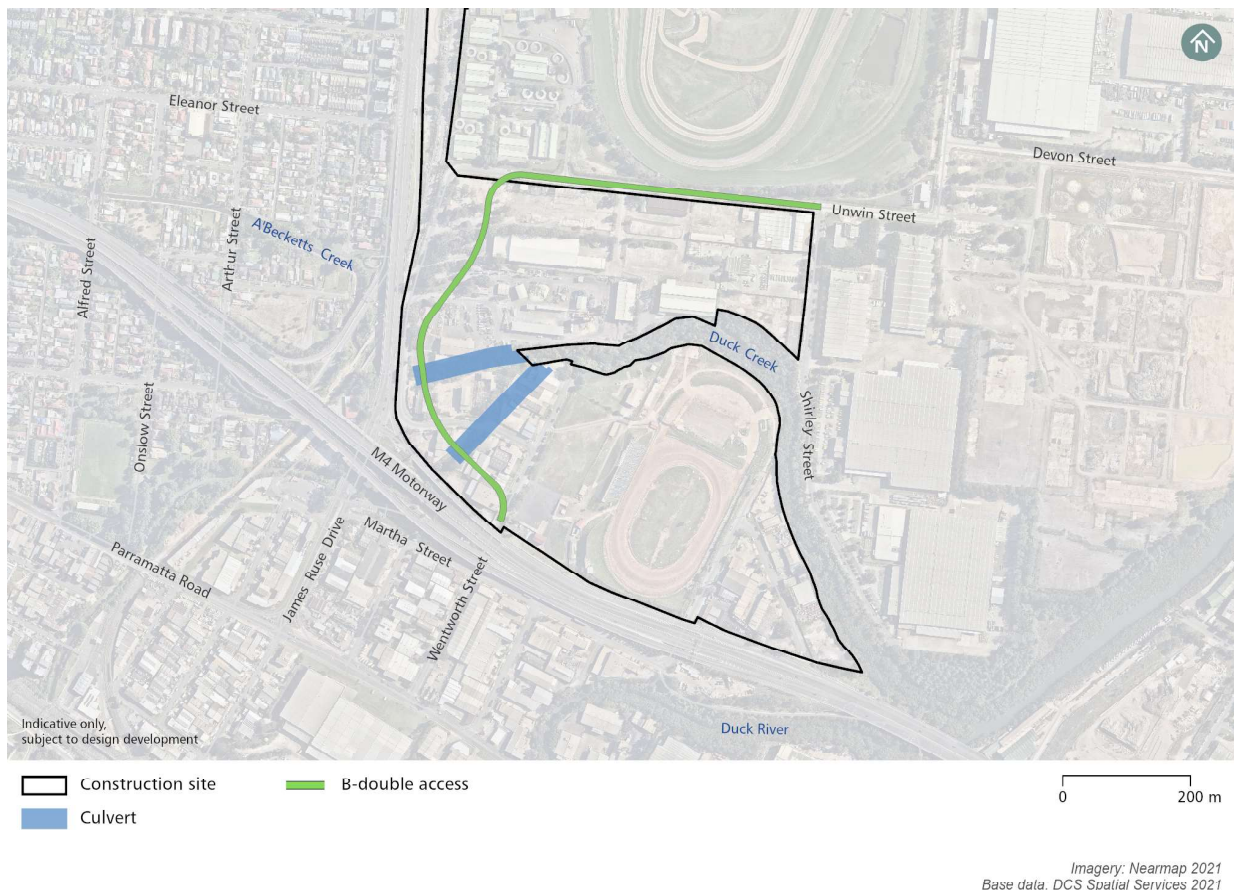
Clyde stabling and maintenance facility indicative construction site
